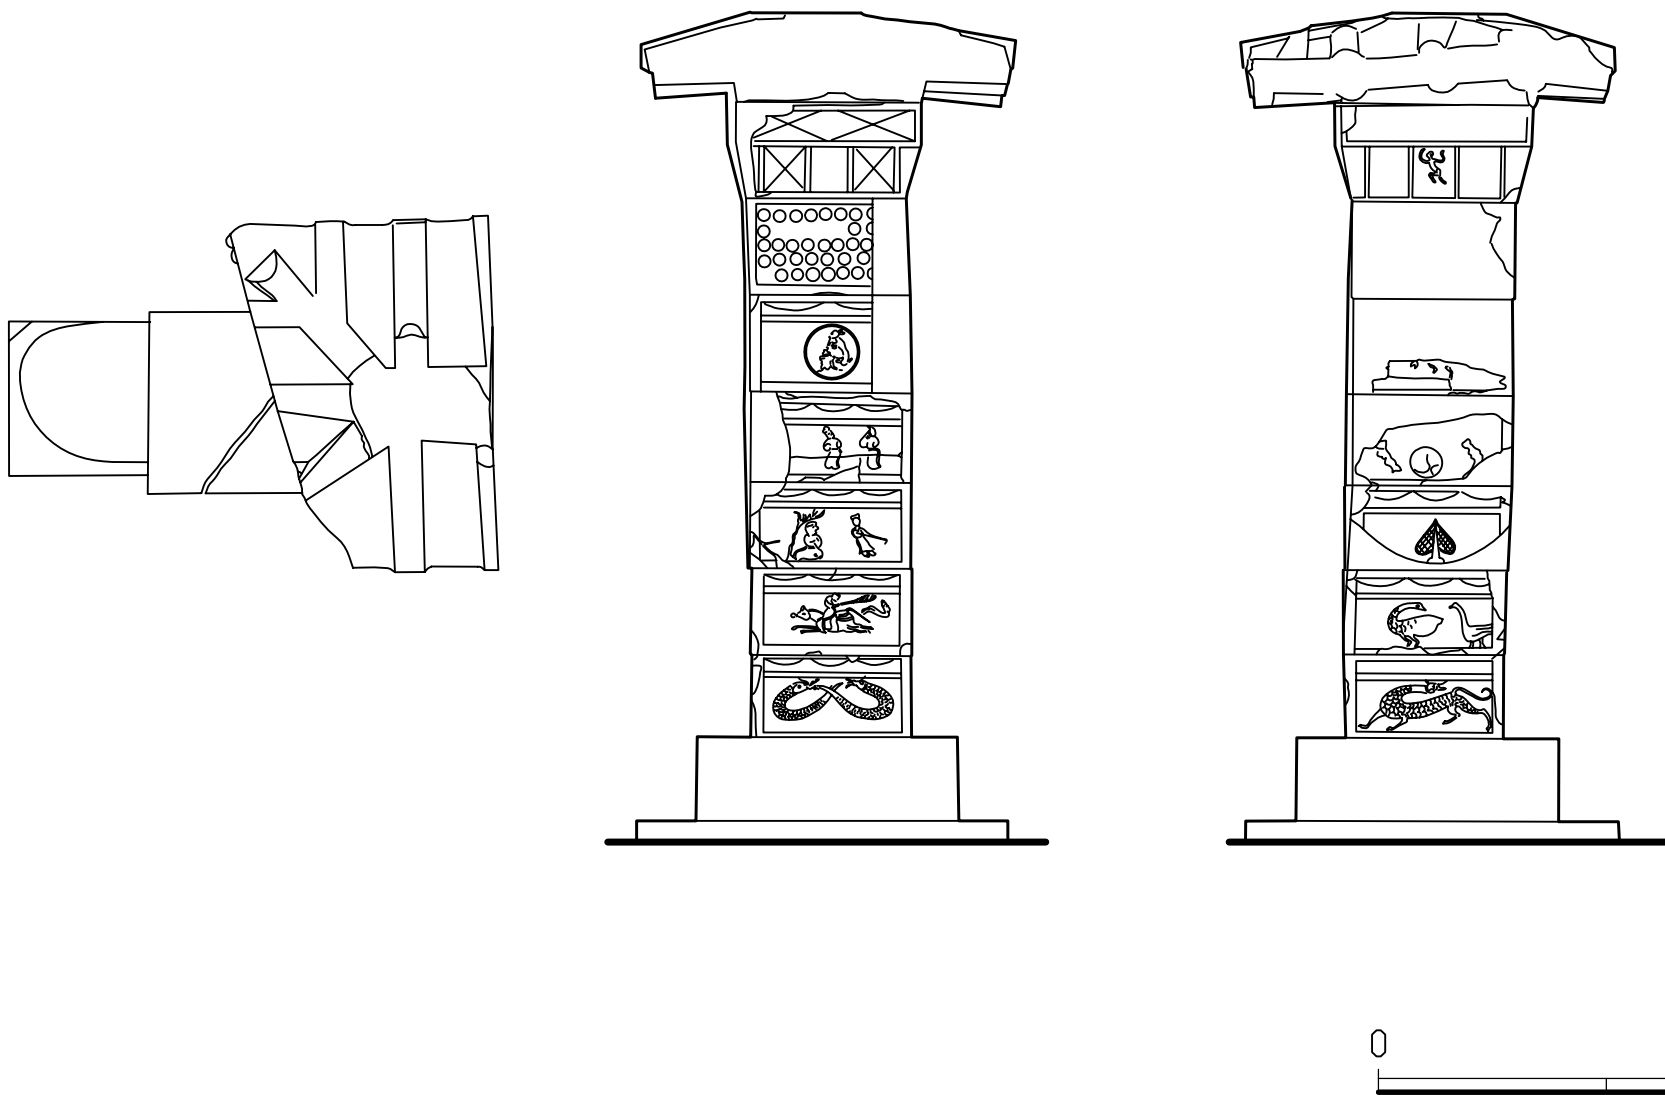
North and south elevation of East Structure of Qimu Que Gates
